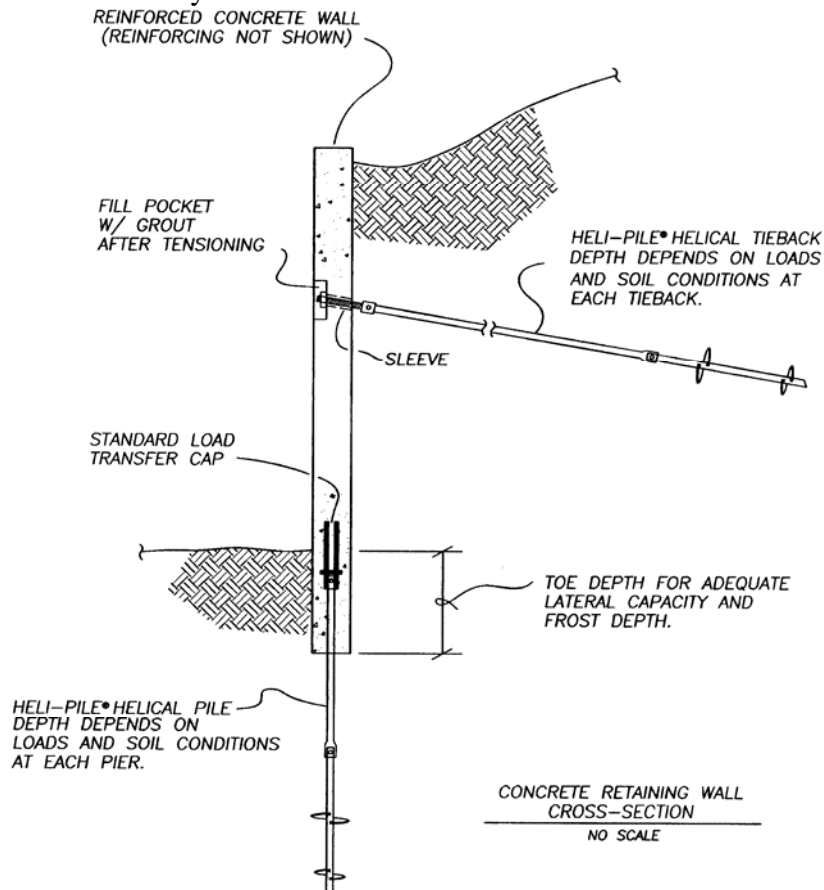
Retaining Wall with Helical Screw Piles and Helical Tiebacks
